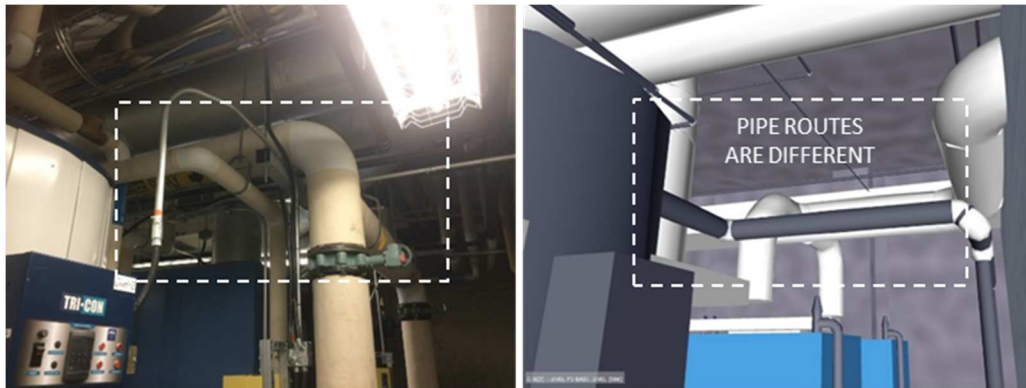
Inaccurate connections of piping and ducts (Courtesy of Leducor Design-Build Inc.)
